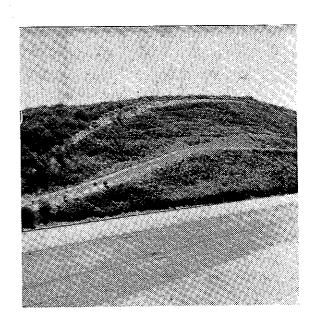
Slope 1 - Full View Figure 7 Slope 1 Bench Cut Area
